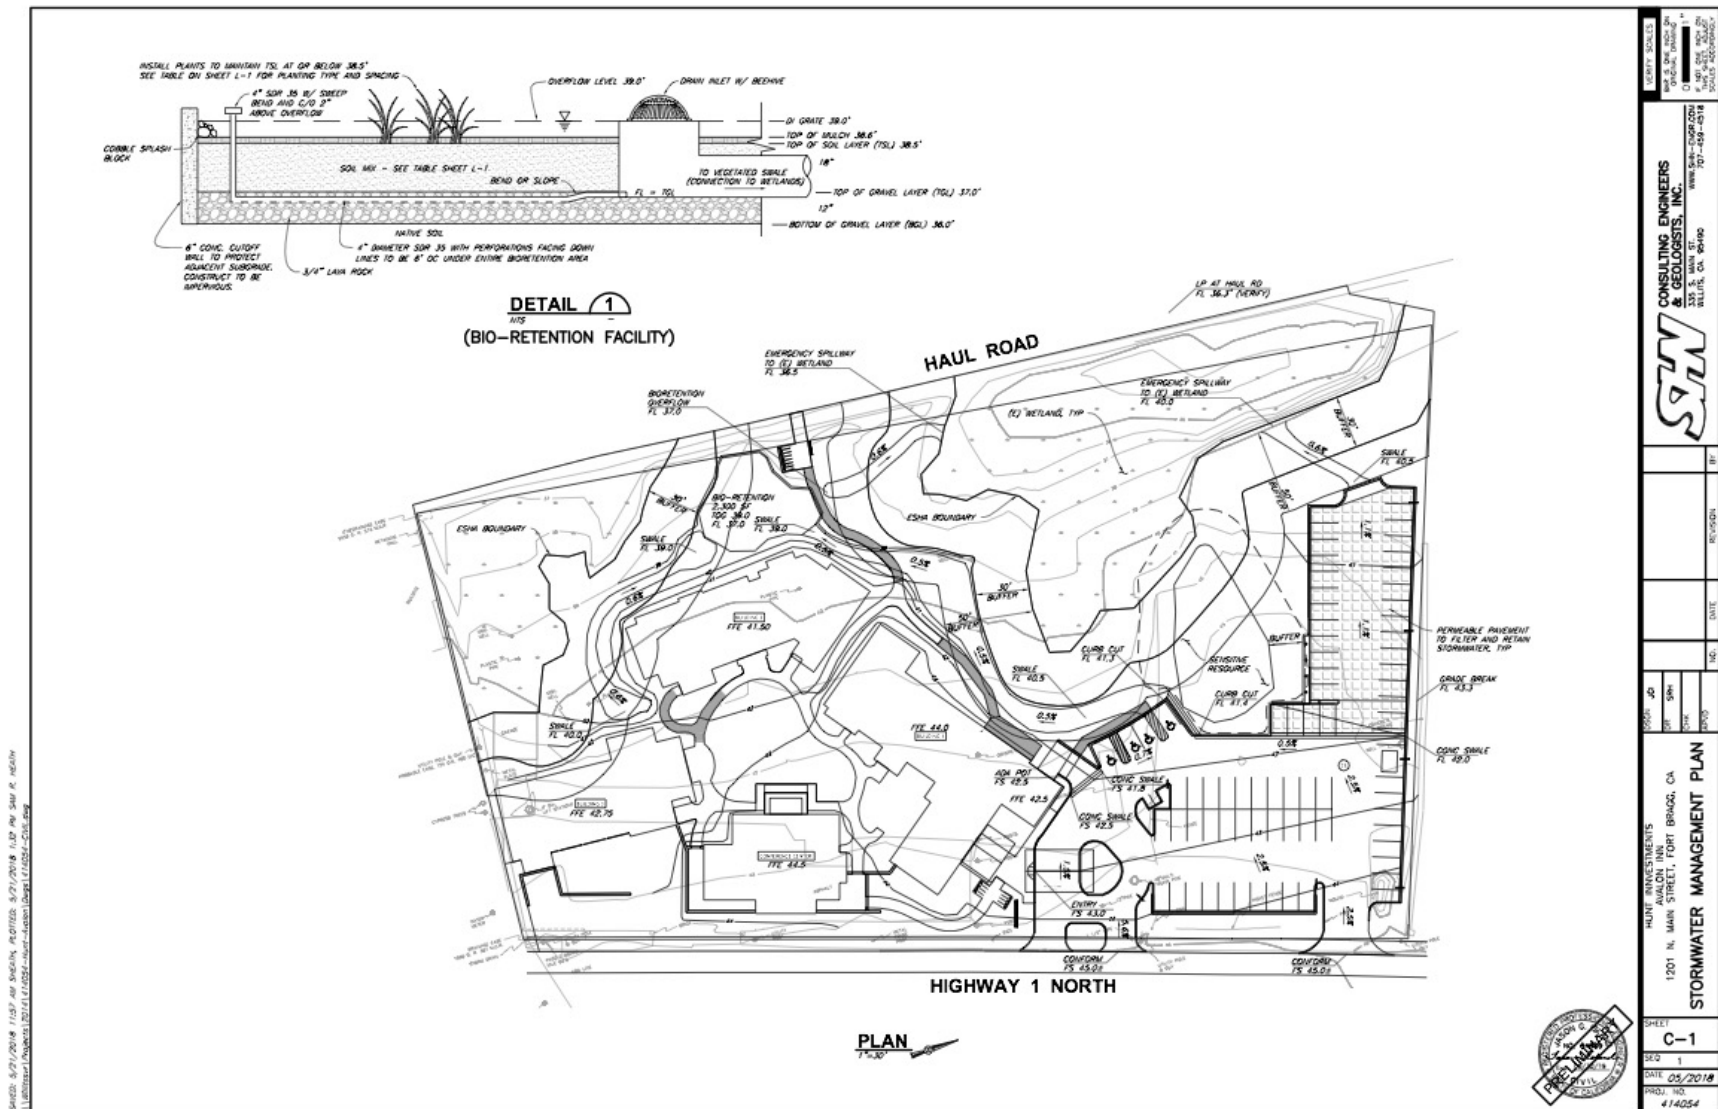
SHN Stormwater Management Plan Sheet C-1, 2018.08, Alternative A (preferred alternative).
